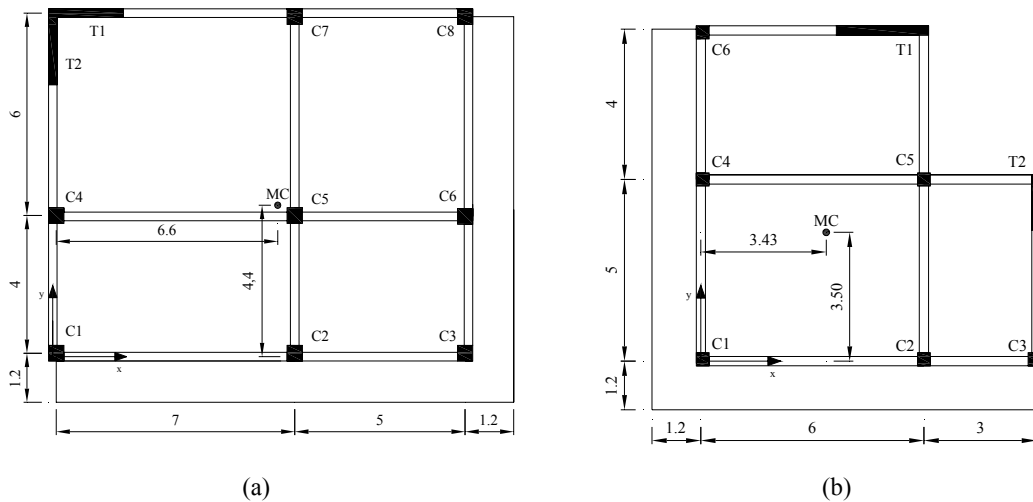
Plan view and geometrical parameters. Building B1 (a) and B2 (b).
